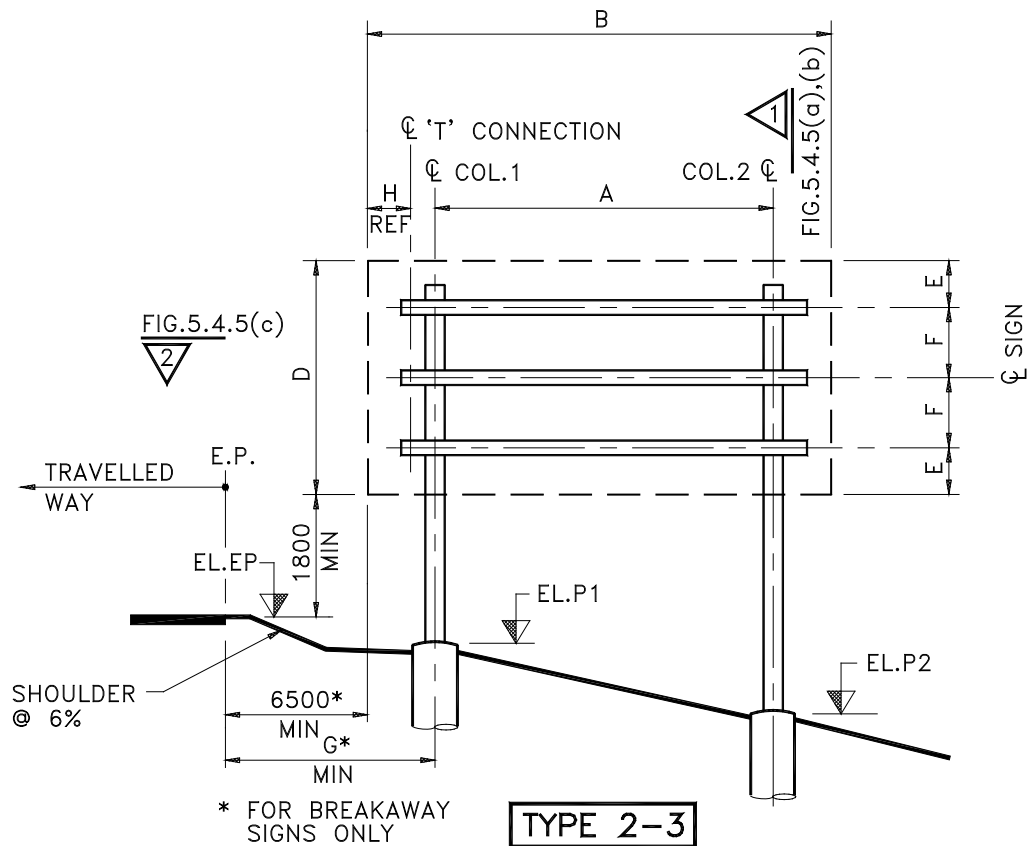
(a) ASSEMBLY AND INSTALLATION DIMENSIONS
